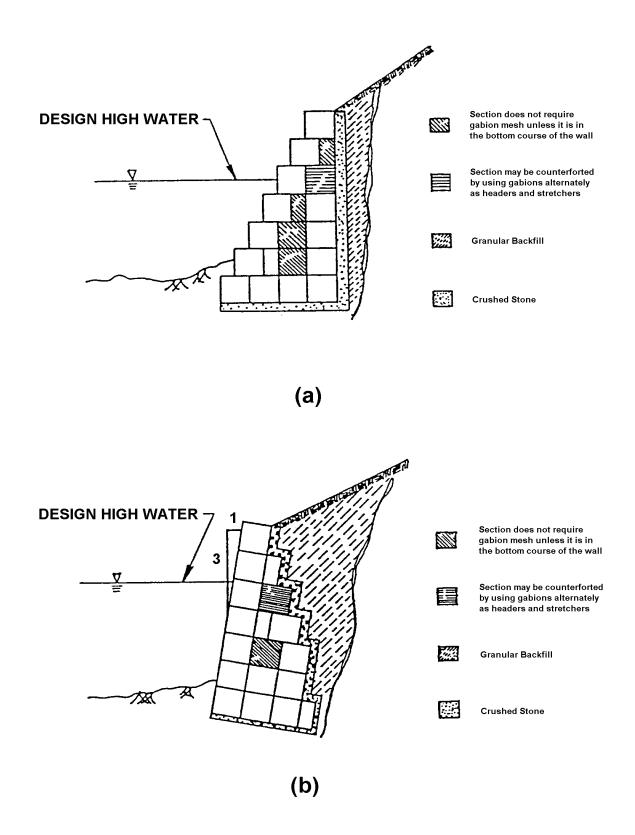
Section Details: (a) stepped-back and (b) battered-gabion retaining walls
